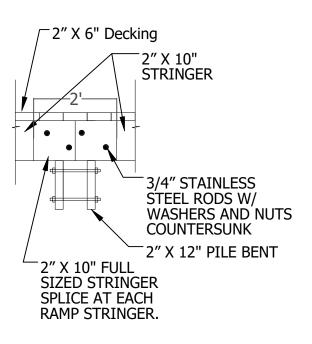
Observation Deck Elevation View - South Dune Crossover Scale: 1 Inch = 2 Feet
